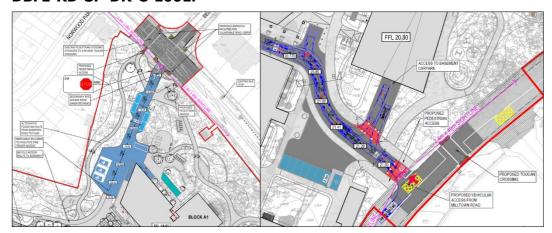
Extract of Subject Site Road Layout [Left: Sandford Road, Right: Milltown Road]
